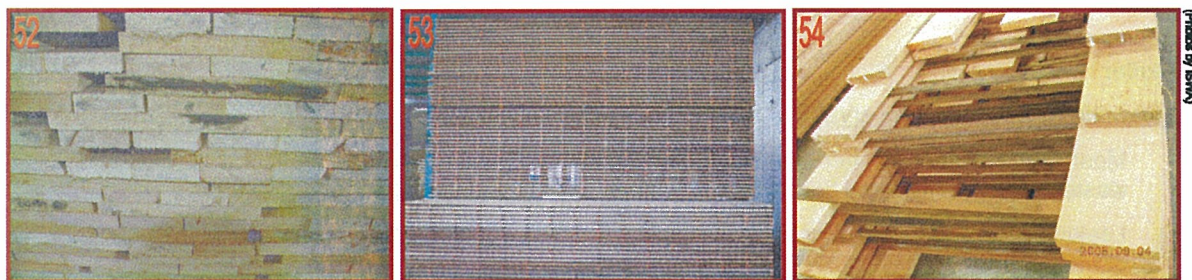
Conditioned timbers stacked without air circulation (52); Conditioned timbers properly stacked (53-54)
